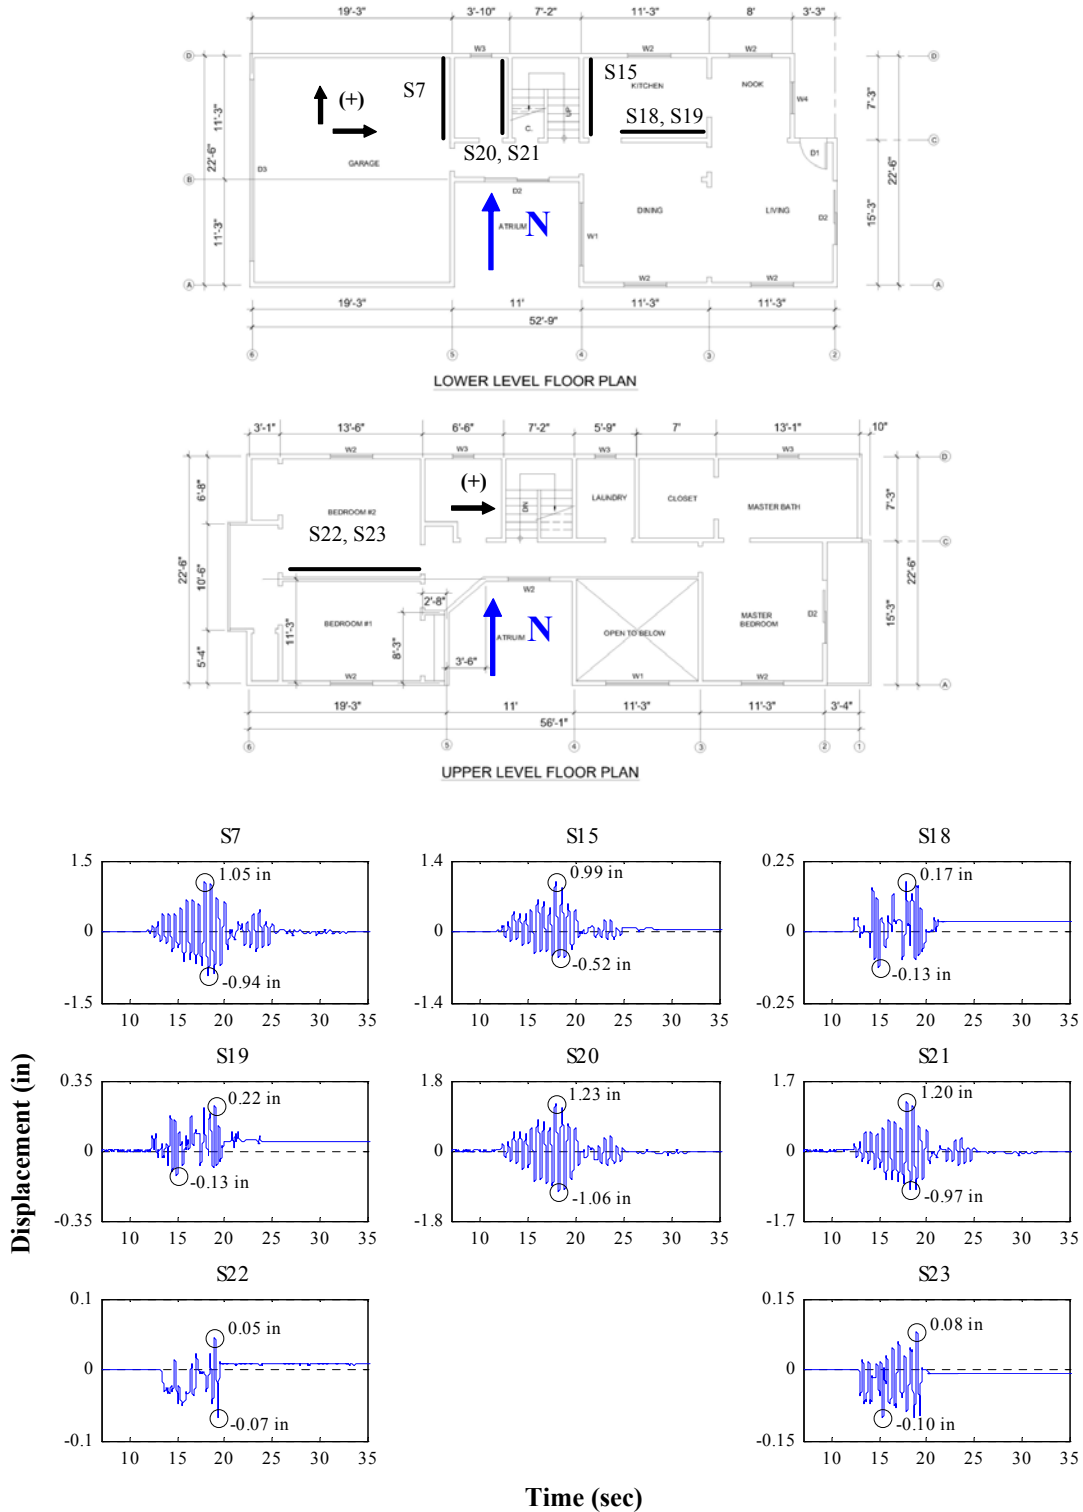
Wall deformations of internal walls for Test NWP1S017
